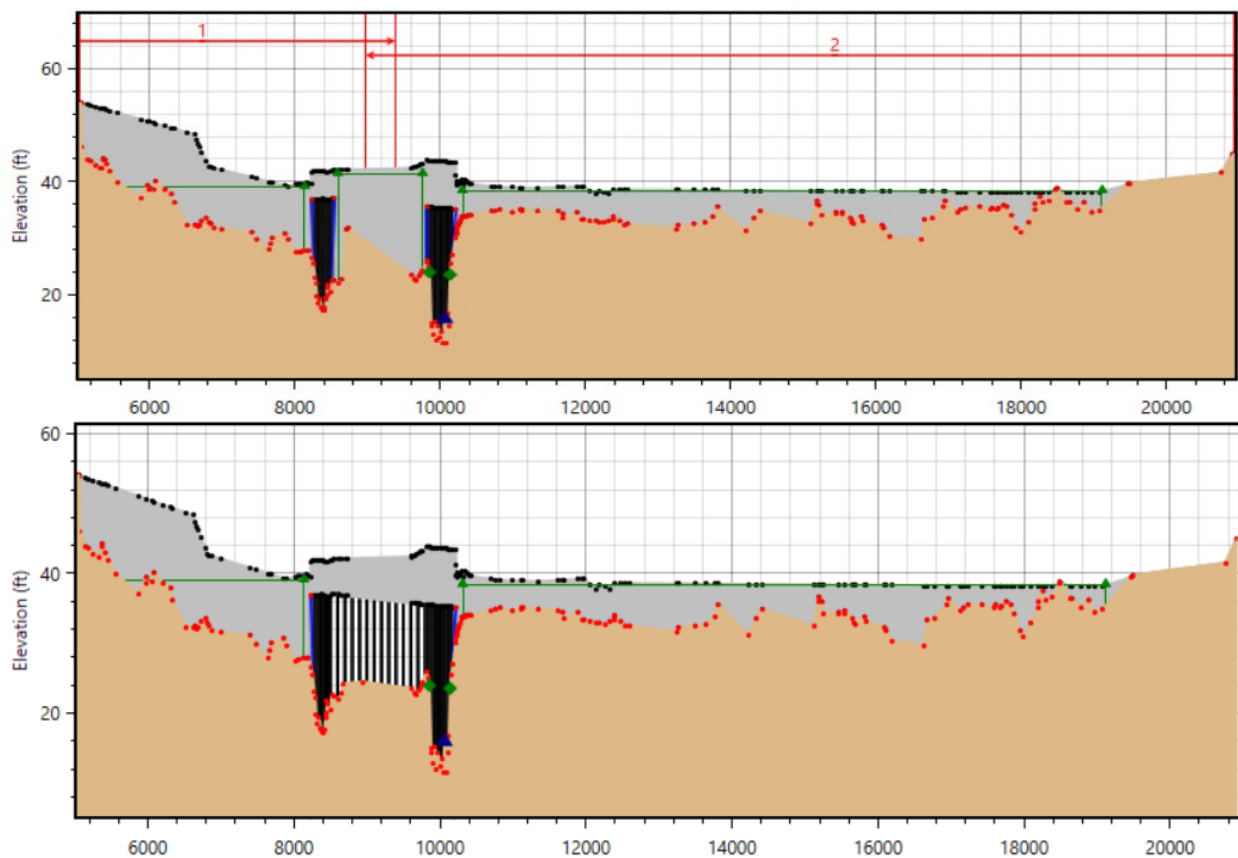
Existing (top) and modified (bottom) cross section for US 70 Bridge in Kinston. The modified cross section shows the embankment partially removed, extension of the bridge deck, and additional piers.
